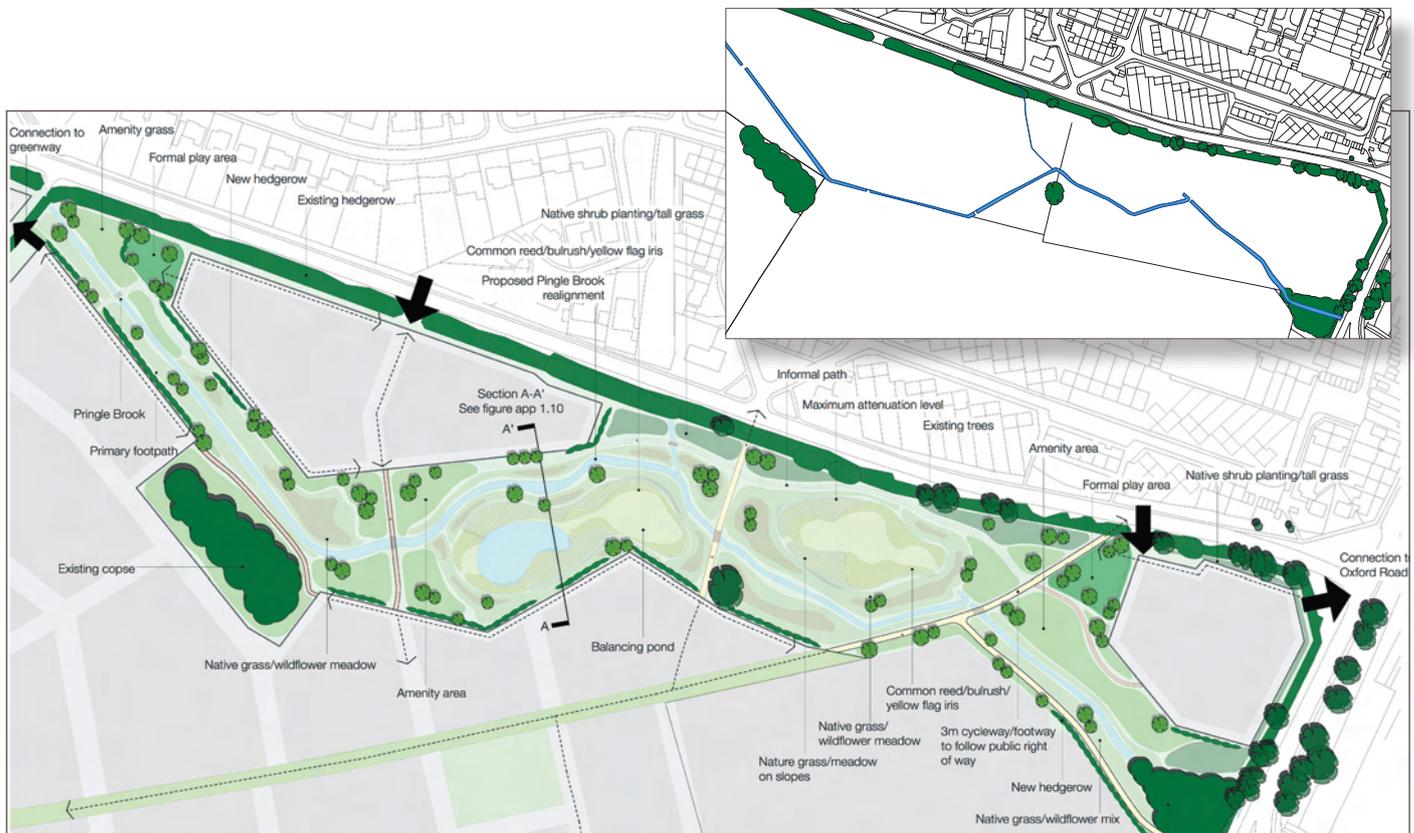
Illustrative layout for Pingle Brook (below). Existing plan (inset above).
